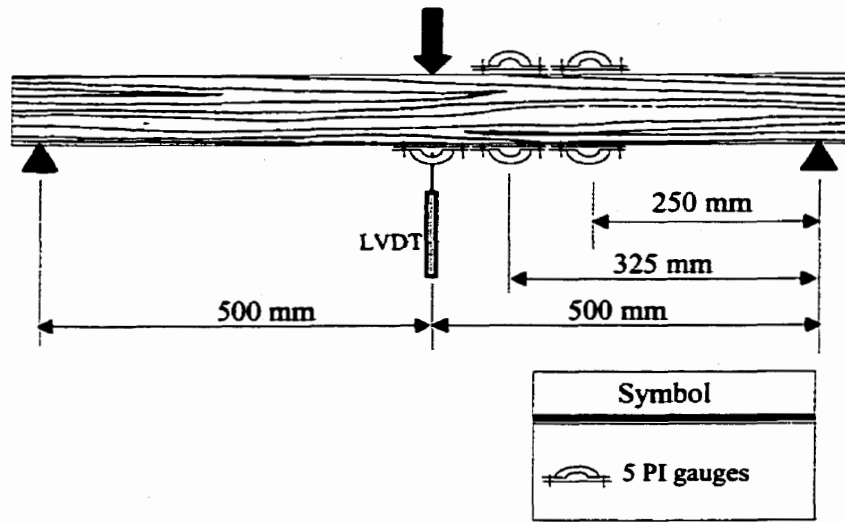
(a): Instrumentation Layout for 200 mm "Timber Only" Bending Control Specimens Tested in Bending
